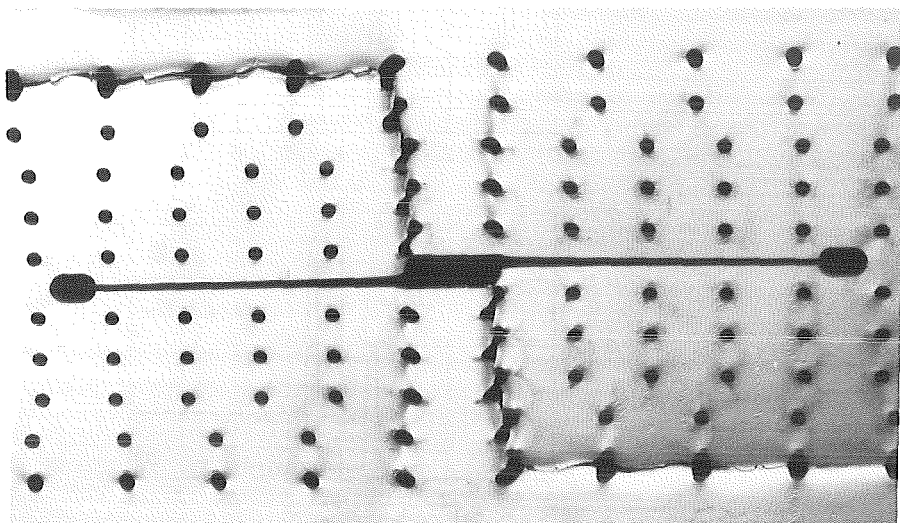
Bolted connection of Konvoi after total failure with cover plates removed.
